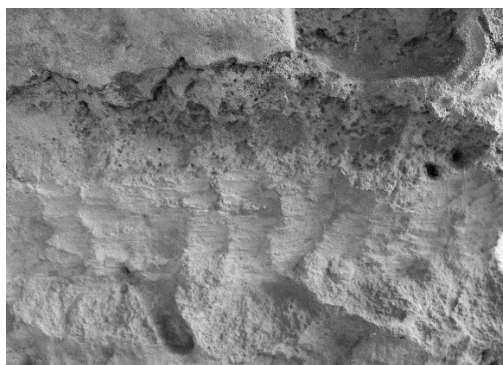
Two types of cutting into the east lower faces. The larger chasing out with crude cutting and the more considered cutting.
